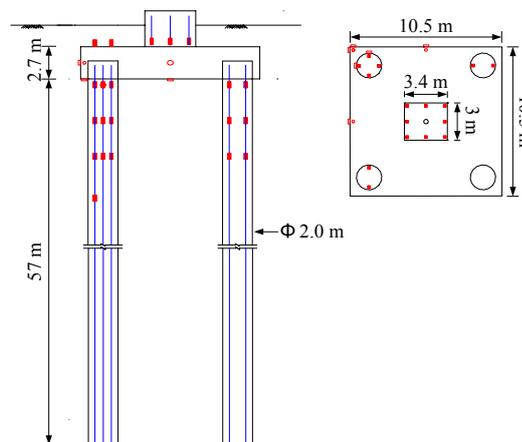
The profile (left) and plan view (right) of the pile foundation(CECI, 2001).
